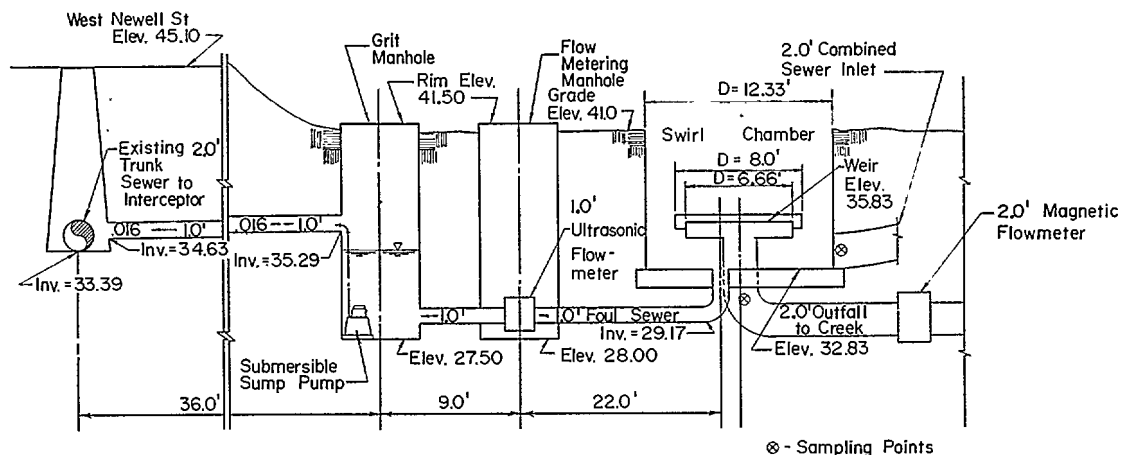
Schematic Profile - West Newell Street CSO Facilities
